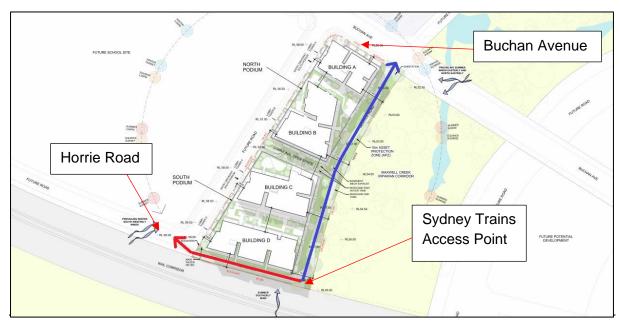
Proposed Local Road (Blue) and proposed Service Road (red).
